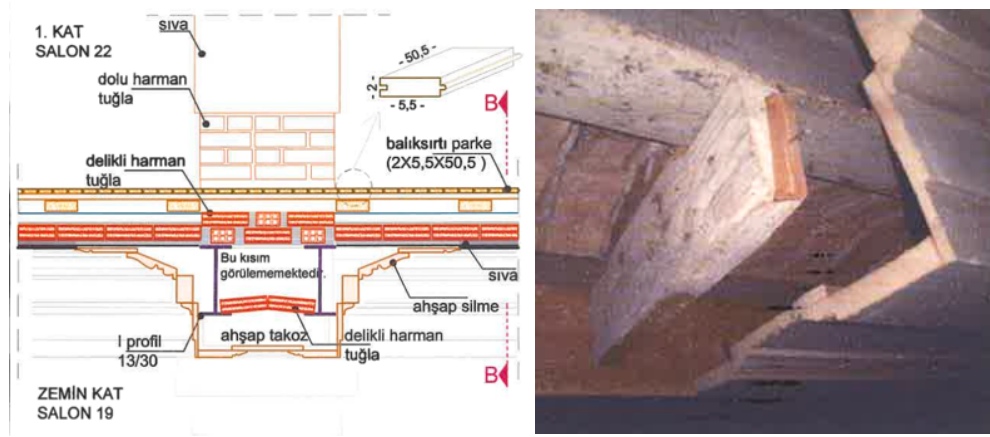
Section BB of jack arched flooring in the Hall 22 (3<sup>rd</sup> Construction Phase of IAM) (Report of *Güryapı İnşaat* dated to February, 2012, IDSM Archive)
